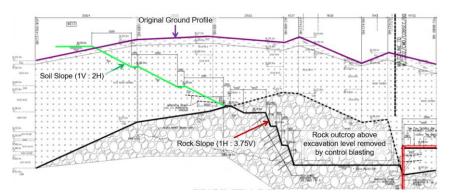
Typical Cross Section View of a Rock Slop below Soil Slope Sections
